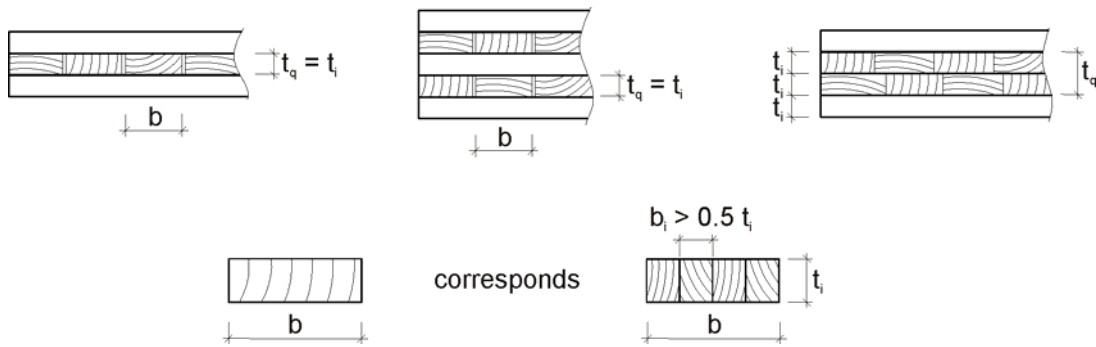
Typical dimensions of cross section of KLH solid wood slab lamellas
